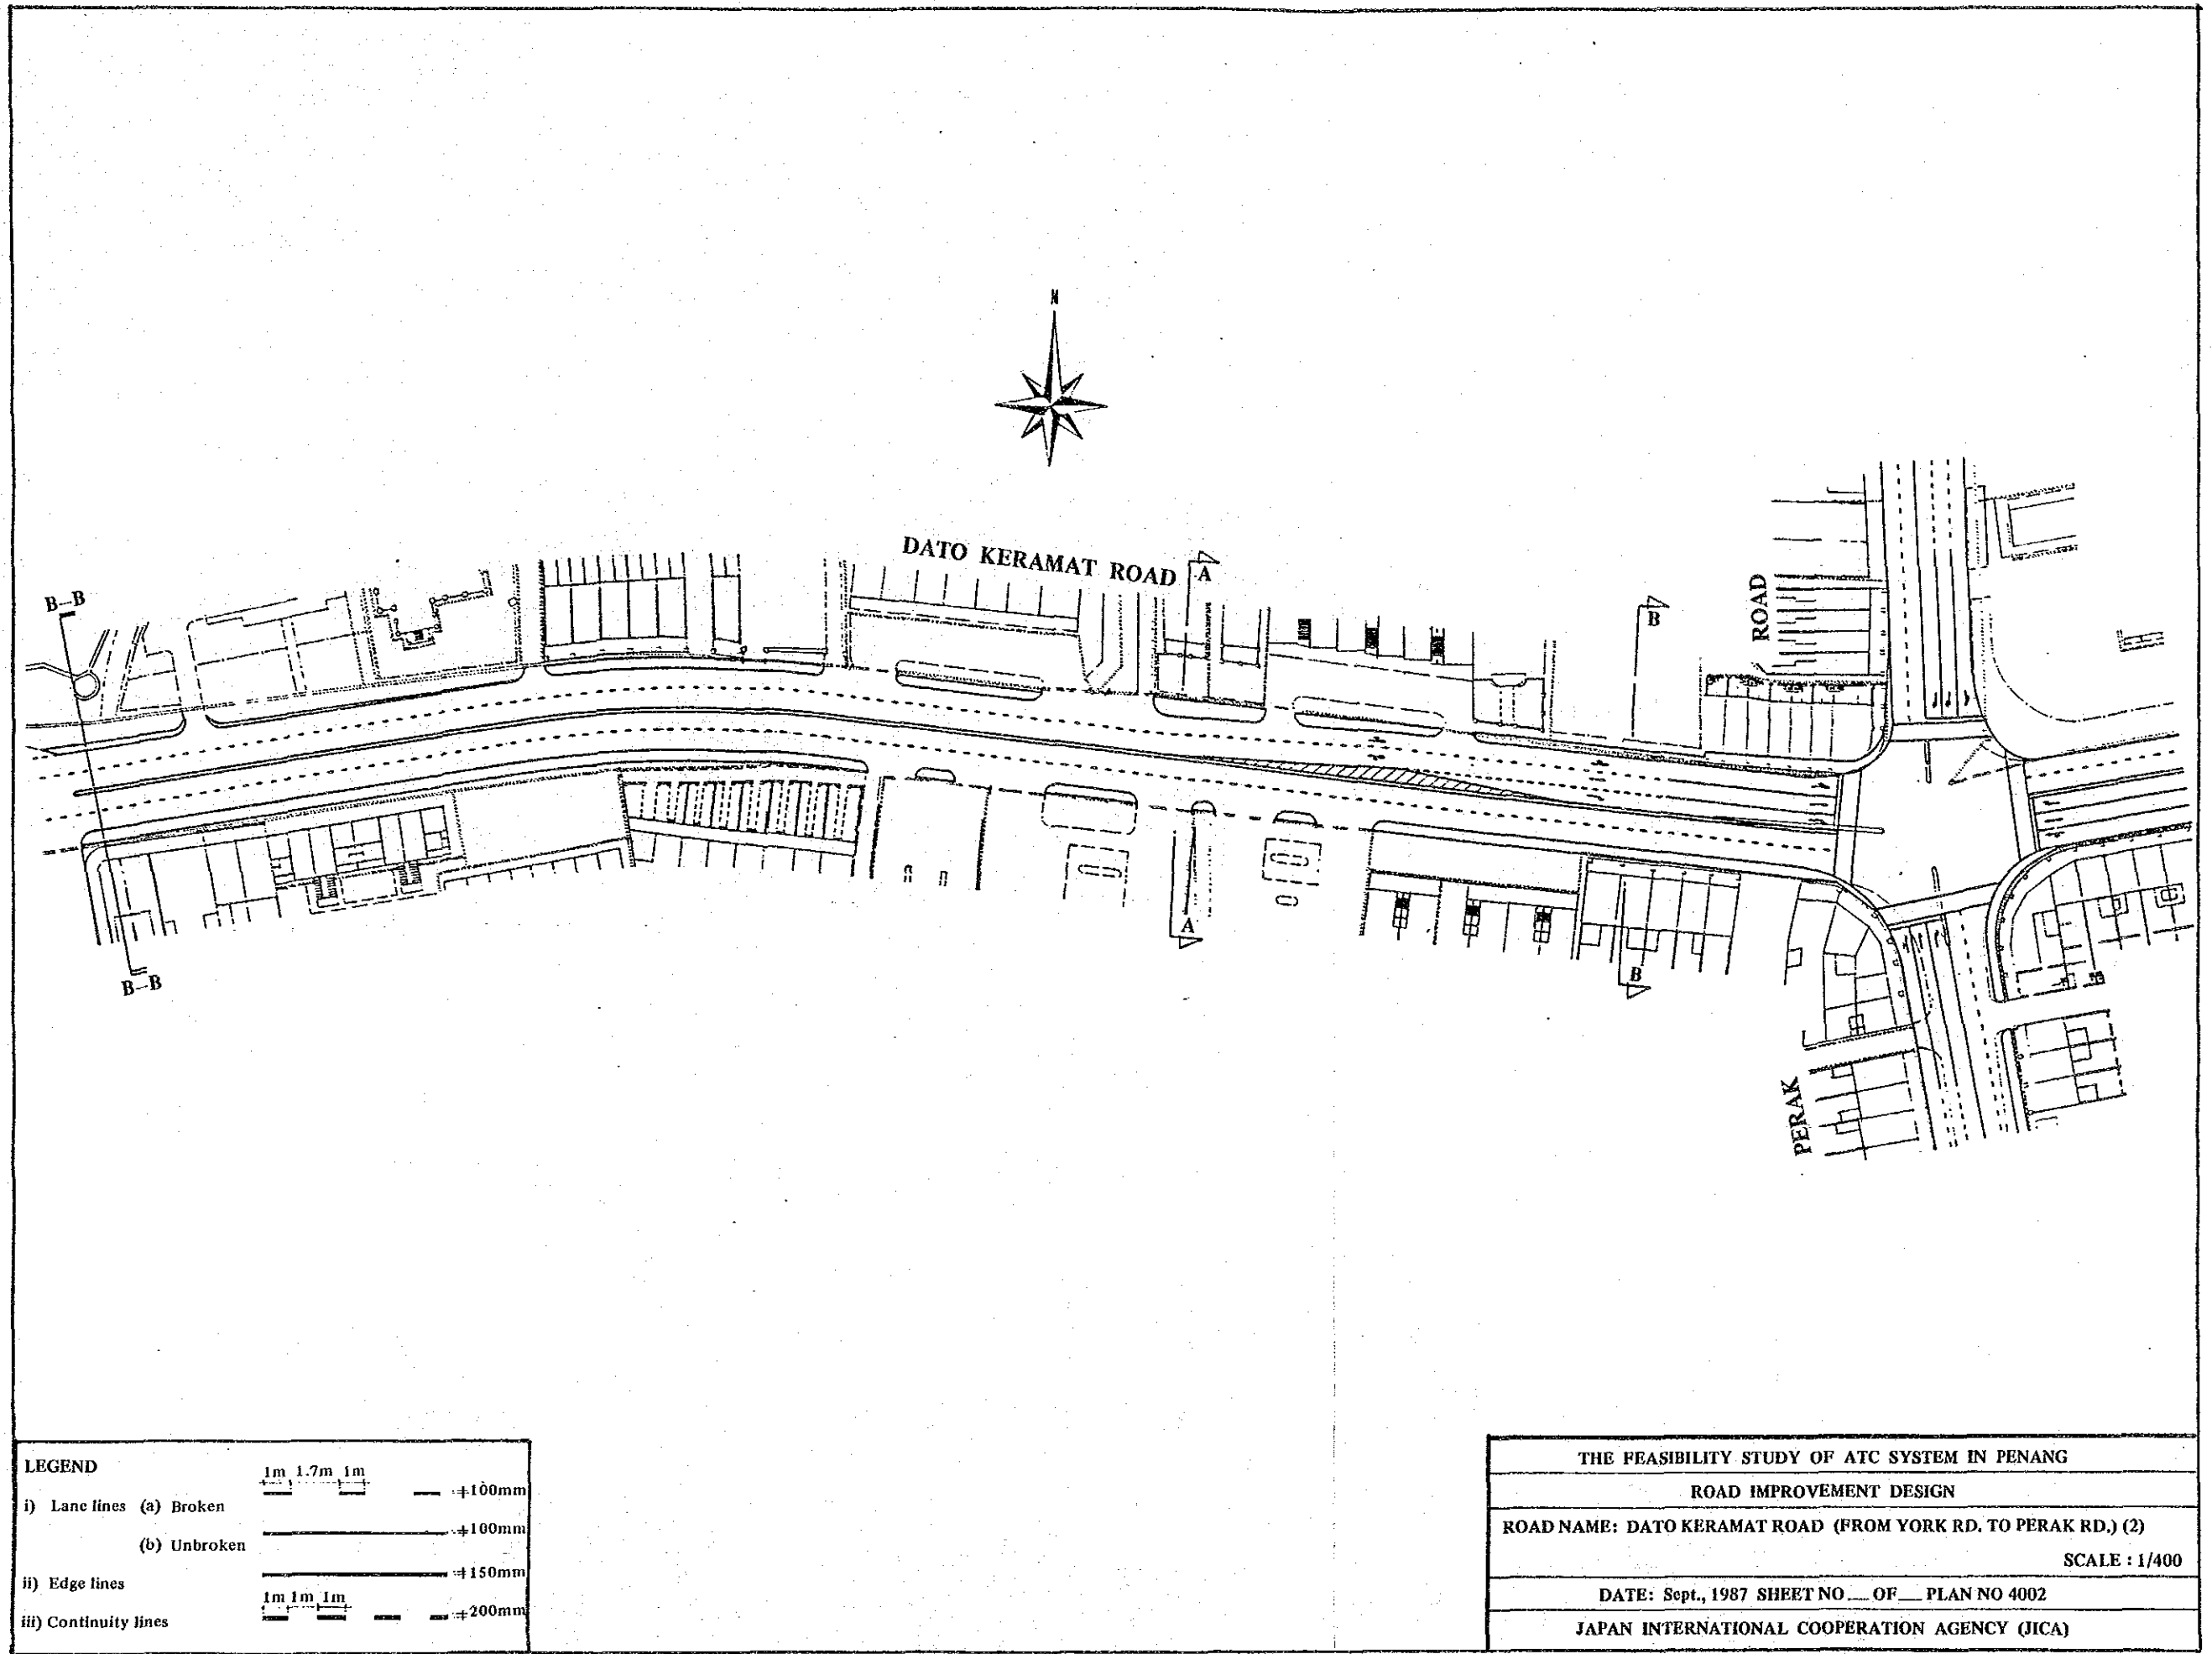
(2) : Layout Plan of Dato Keramat Road
